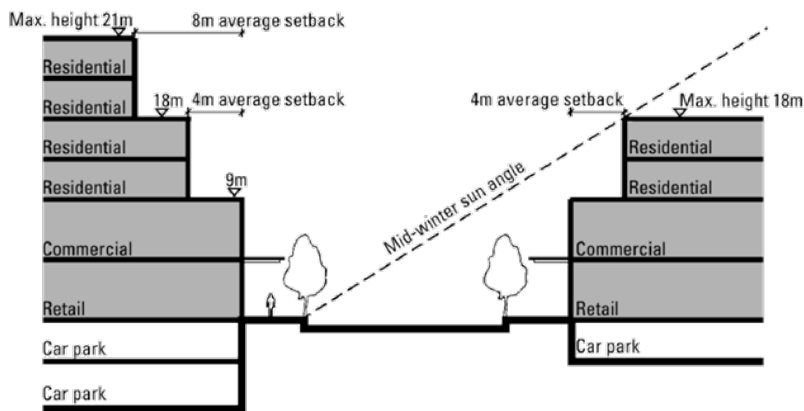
TYPE 4 STREET, SECTION THROUGH MIXED USE BUILDING
